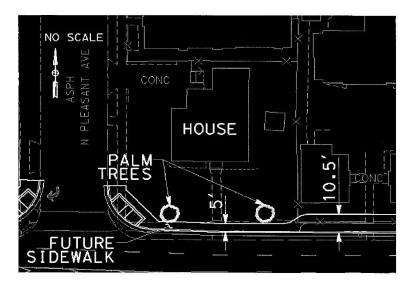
The City of Ontario reviewed but did not accept plans which would have removed a proposed parkway, which would have left the two historic date palms in their current location.
